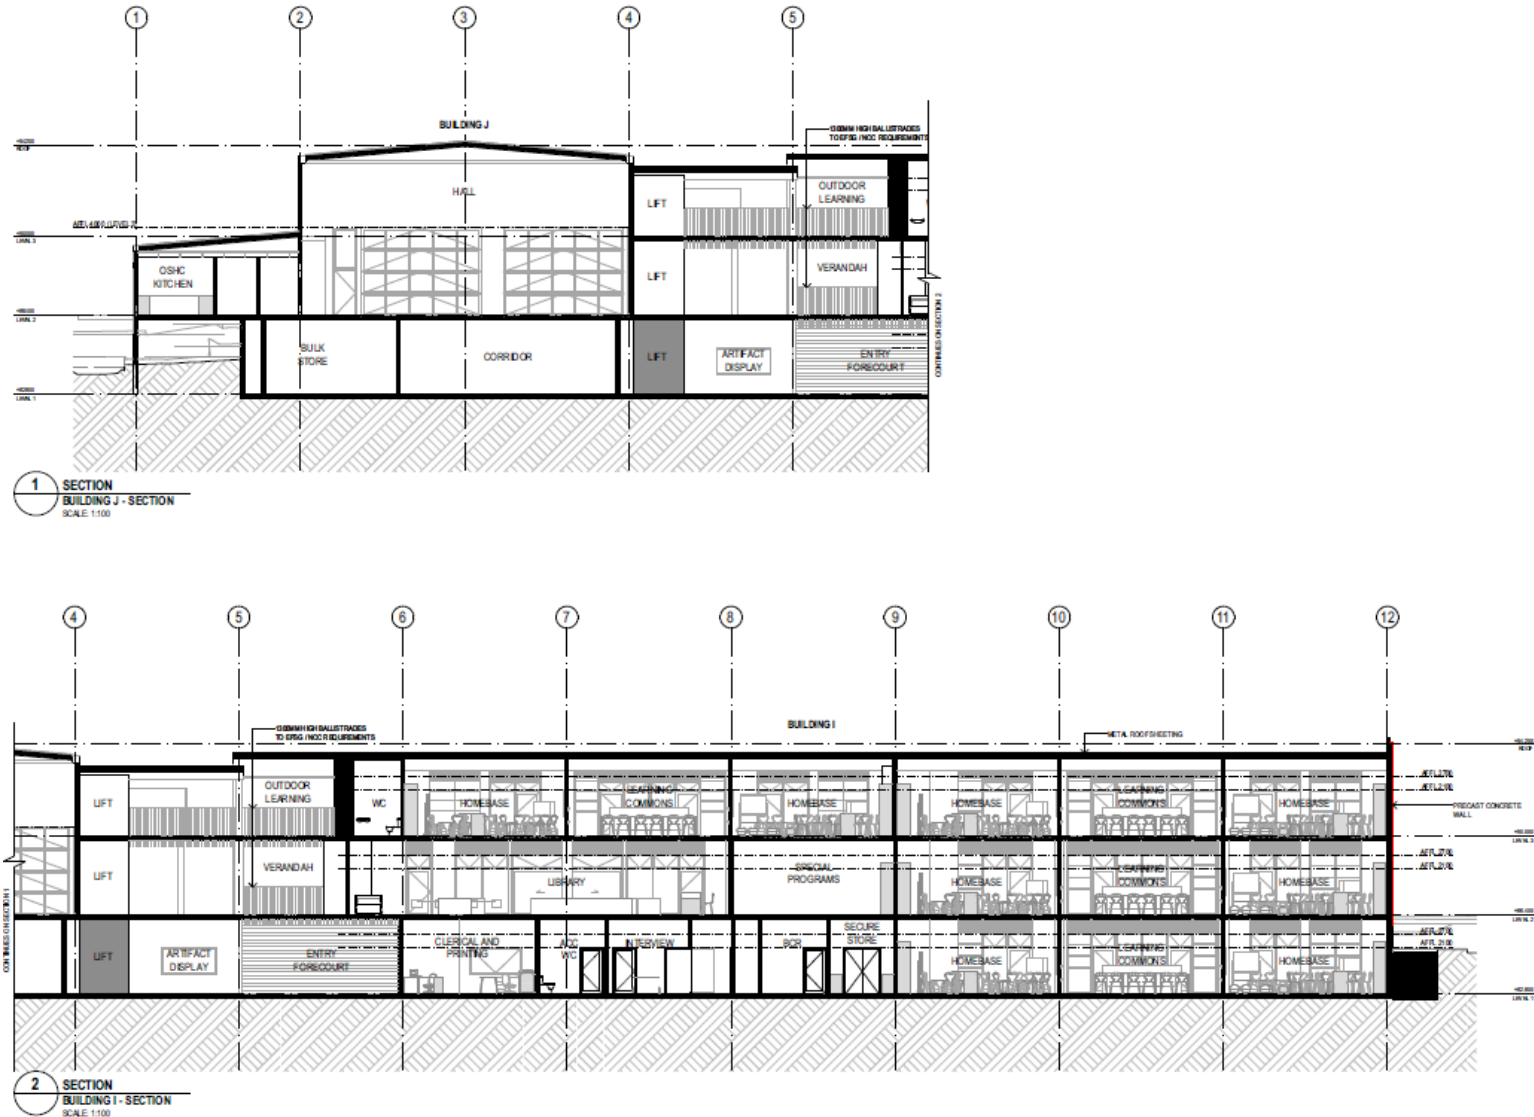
Proposed Buildings J and I Section 1. Source: Fulton Trotter, 2021
